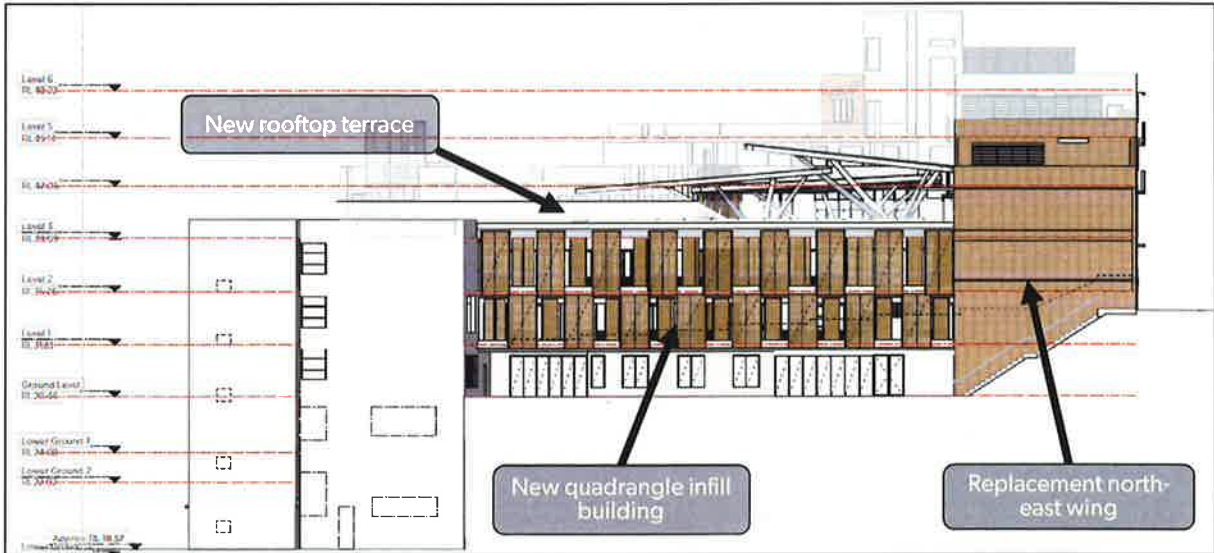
| Main Campus – Proposed Eastern Elevation (Source: Applicant’s RtS 2018)
